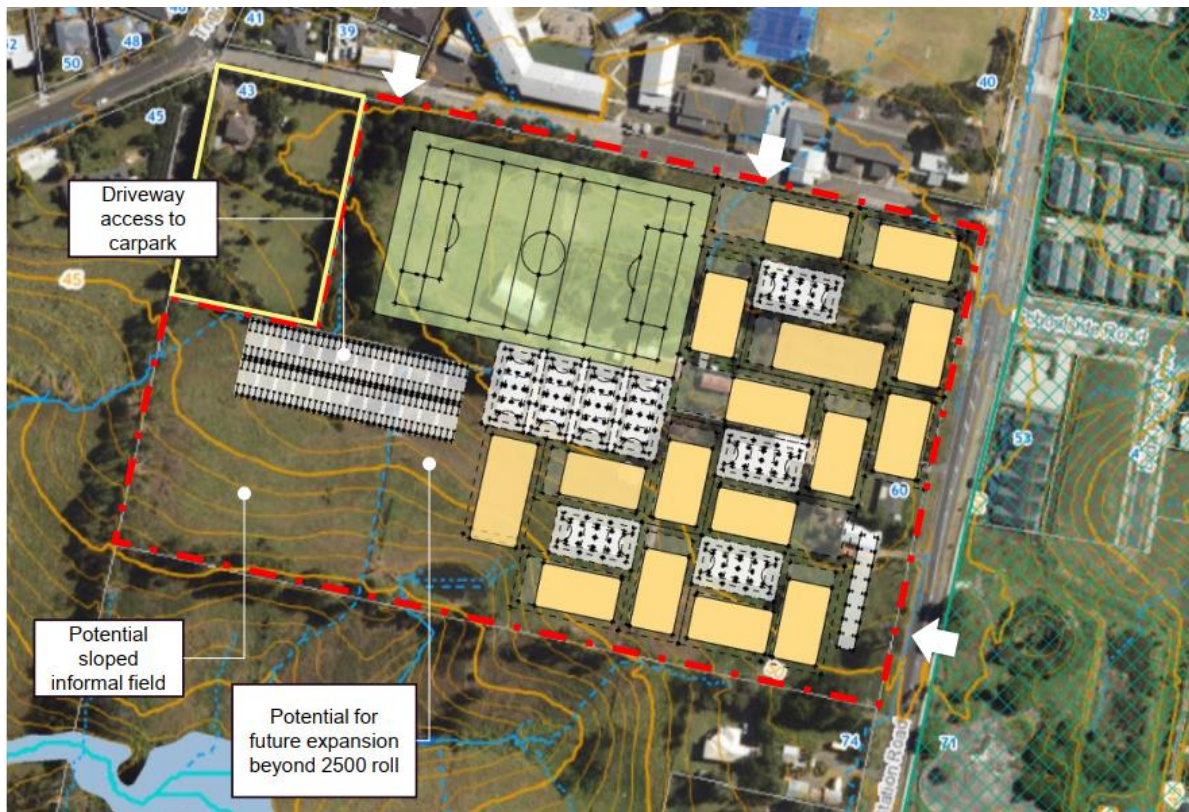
Site 35/51 layout (Source: The Ministry's School Property Standard Planning Team)
